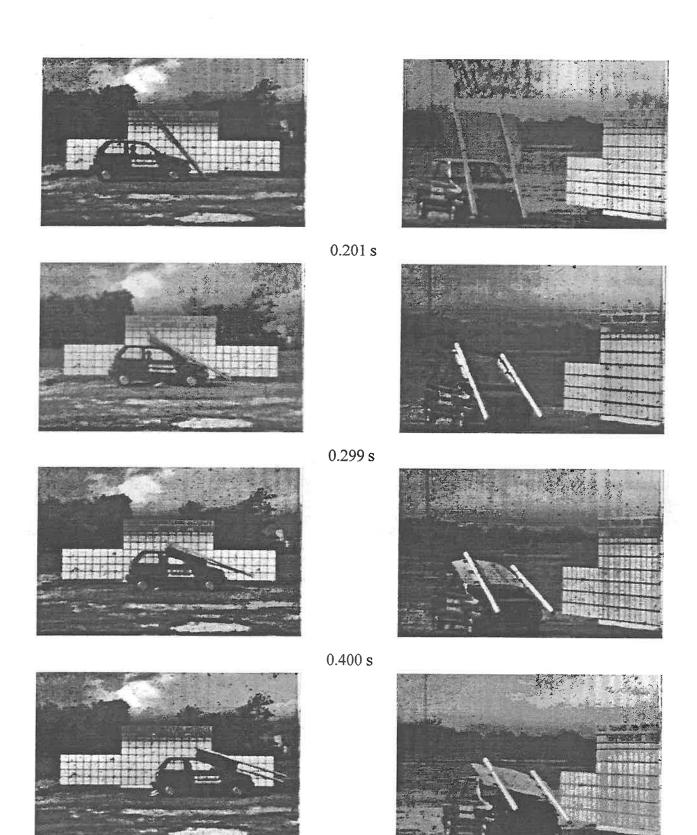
Sequential photographs for test 405231-24 (continued). (perpendicular and angular views)
